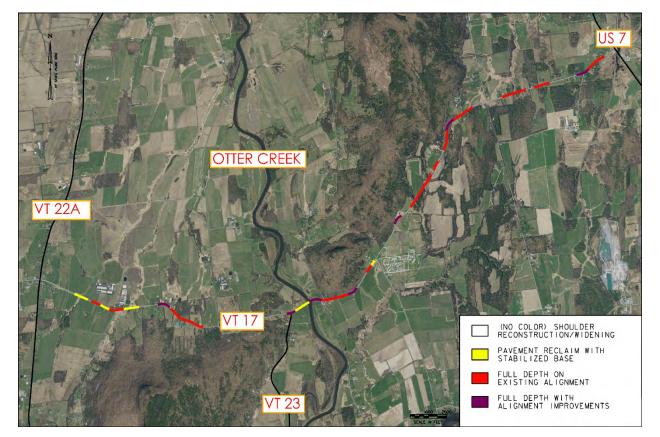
Proposed Treatments for VT17 – Alternative C Concept Plan
